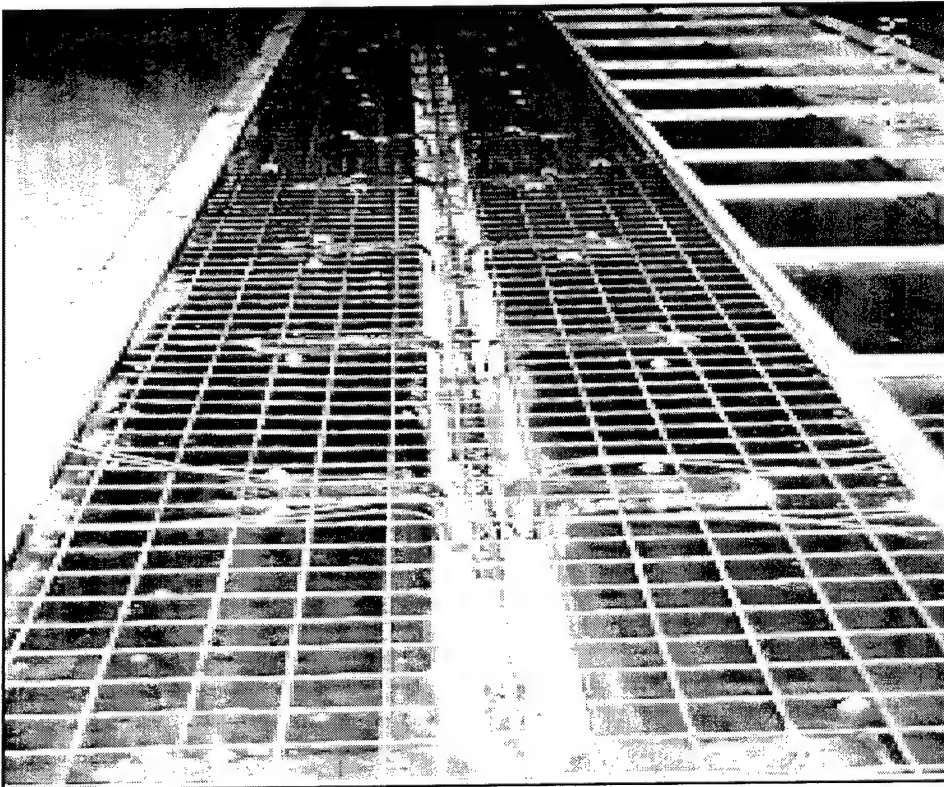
Placement of top flange reinforcement in sample specimen.
